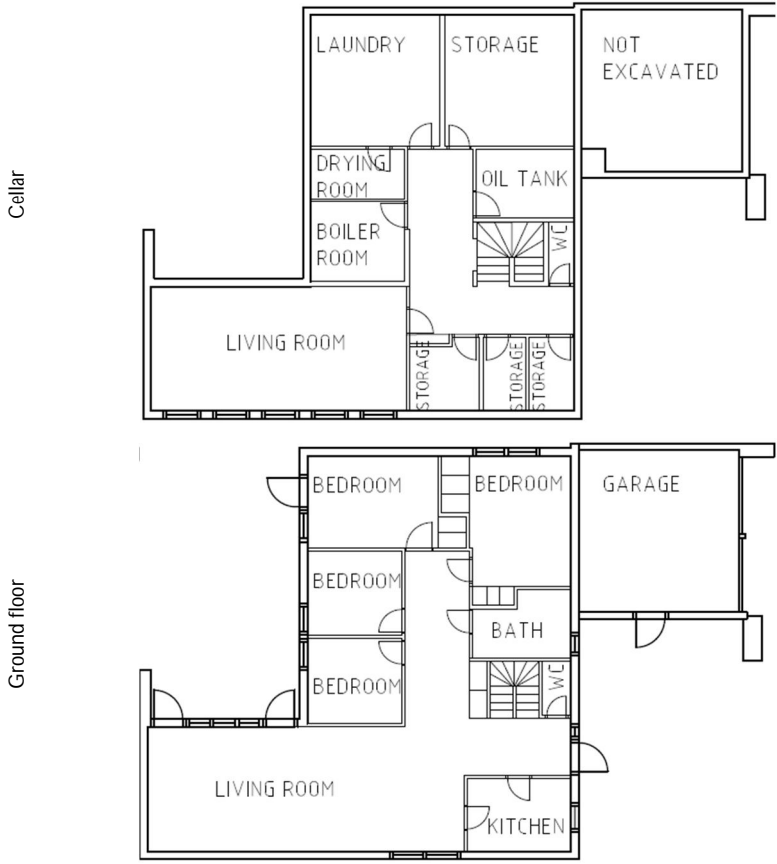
Floor plans of the basement and ground floor for reference house 1.
